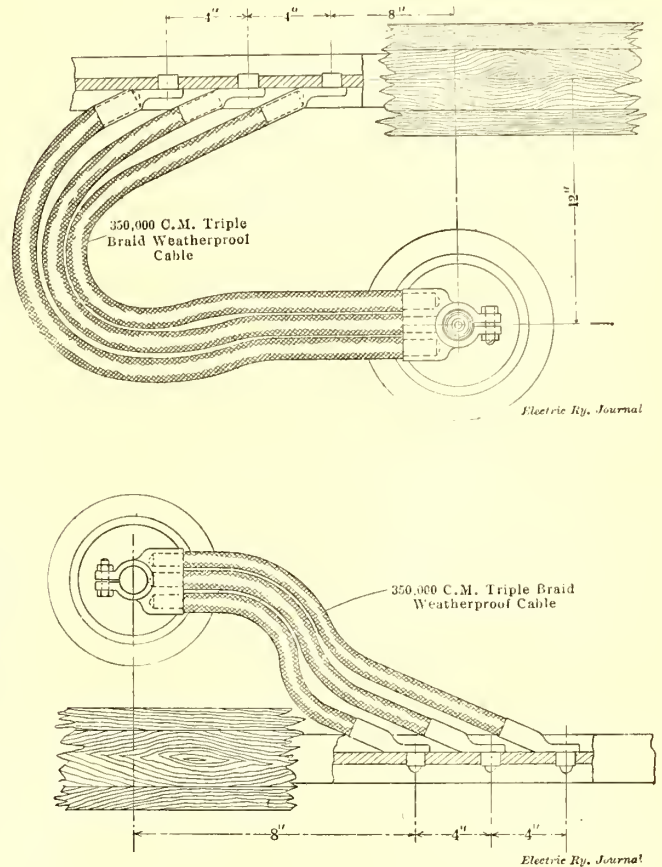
Detroit Tunnel—Terminal Insulation and Other Details of Third-Rail Cables
